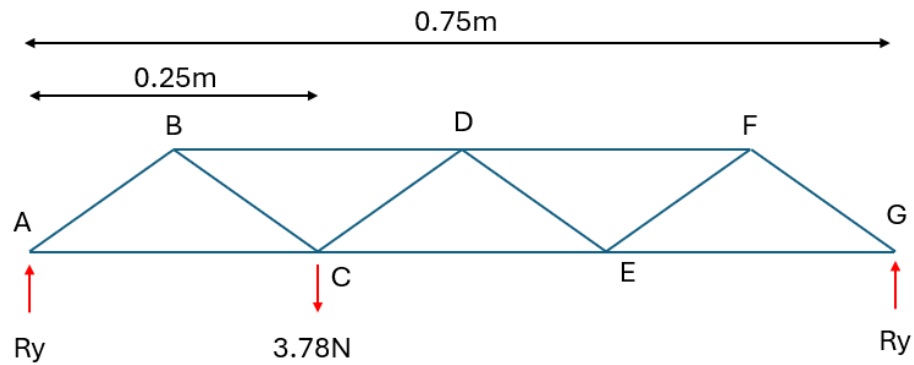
Warren Truss Cantilever Bridge Five Cell Ski Civ axial forces
